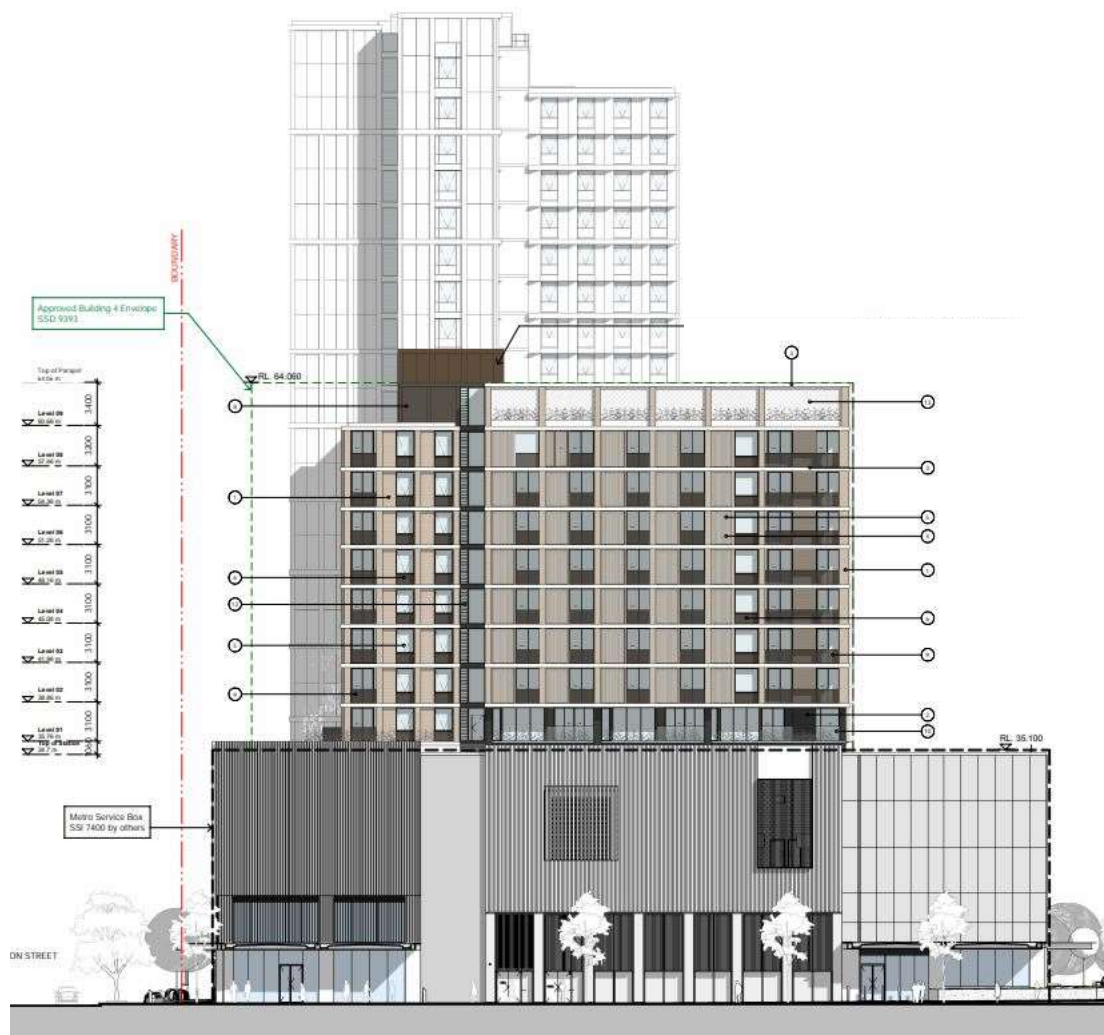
| West Elevation (Botany Road) of student housing tower (source: Applicant's EIS)
